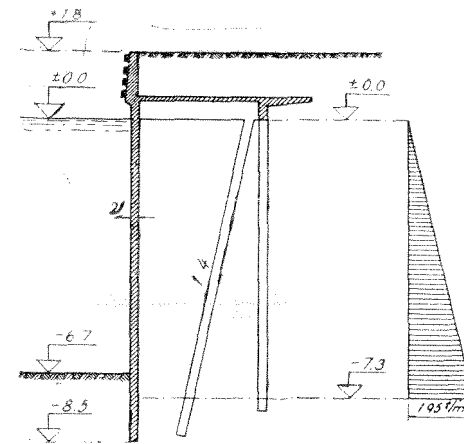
Cross Section of Quay Wall at Assens, built in 1906.
